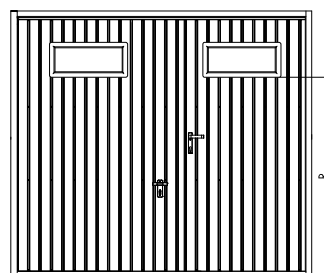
A/H horizontal glazing in the door with a wicket door.
